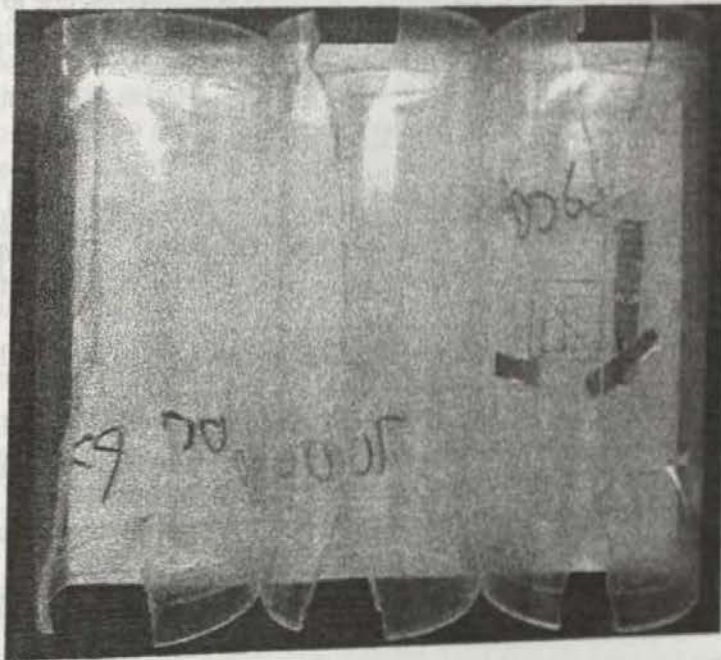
Failure Modes Of Bare Plexiglas Specimen
